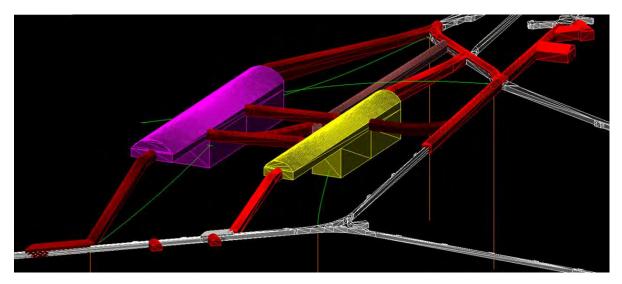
Isometric Drawing of LBNE Cavern Complex, View From Above Looking Southwest (drawing provided by ARUP)
